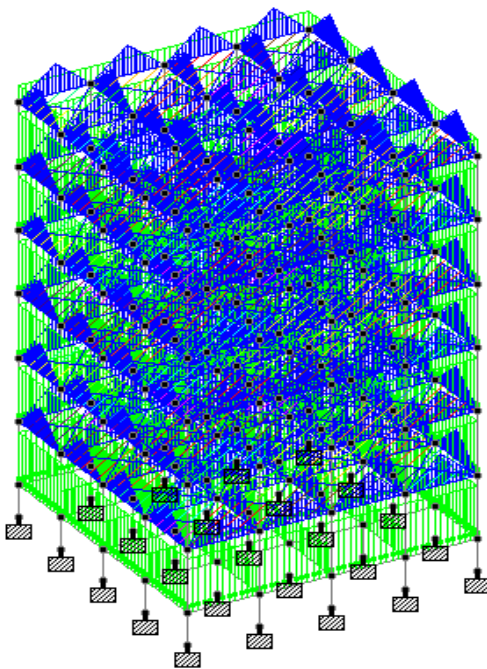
Dead and Live Loads on the RCC frame Modelling of Soil Layers and Foundation:
